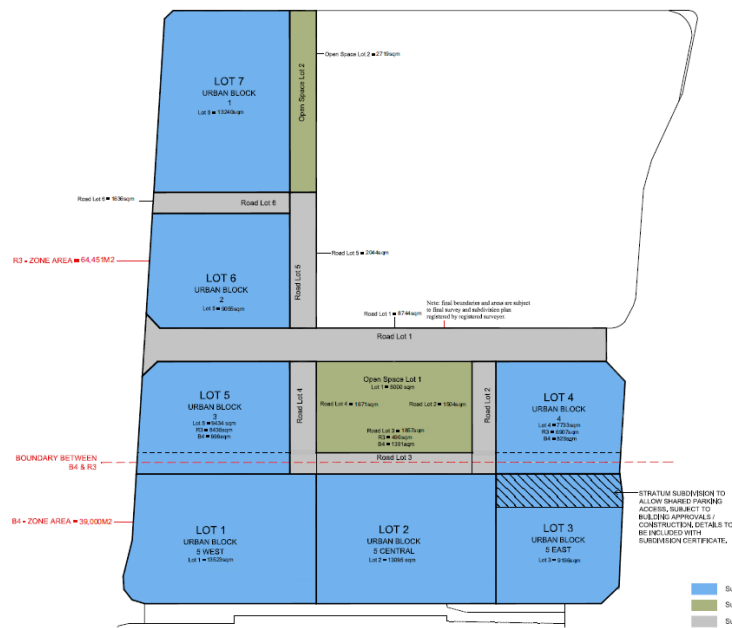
Approved Master plan concept subdivision plan DA-14/96
